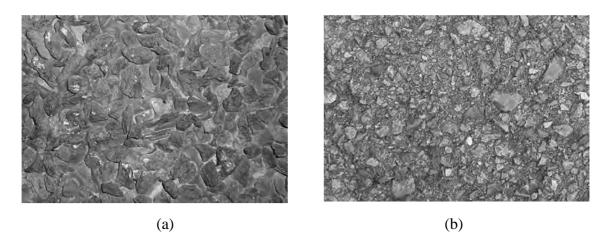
a) Section of sample road surface and b) section of road surface at Gumbeel Court.
